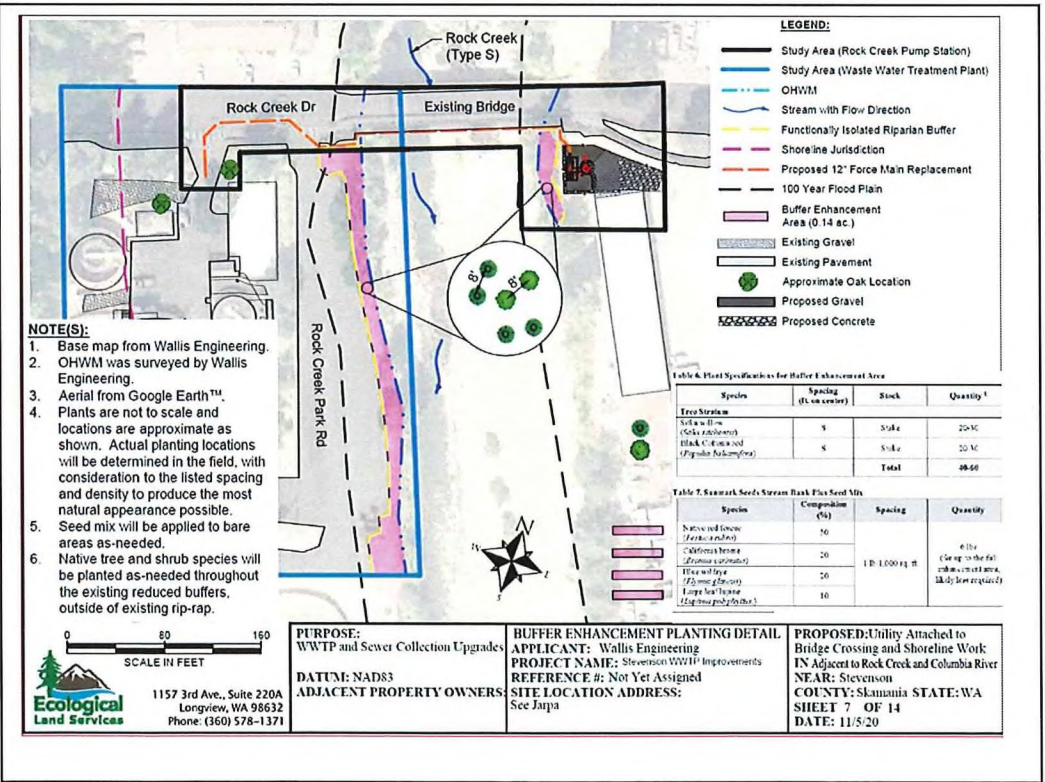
Rock Creek and WWTP Approved Landscape Plan
